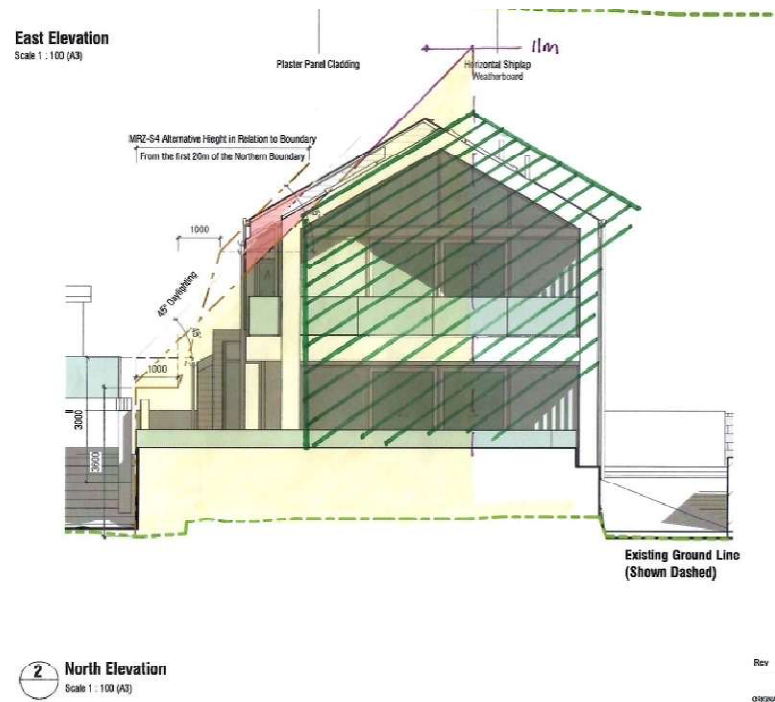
Front elevation of 26 Woolcombe Terrace showing MRZ S3 HIRB envelope in yellow, and the same building design moved to fit within the envelope. This places the outer front wall approximately 1.5m further away from the neighbouring 28 Woolcombe Terrace.
